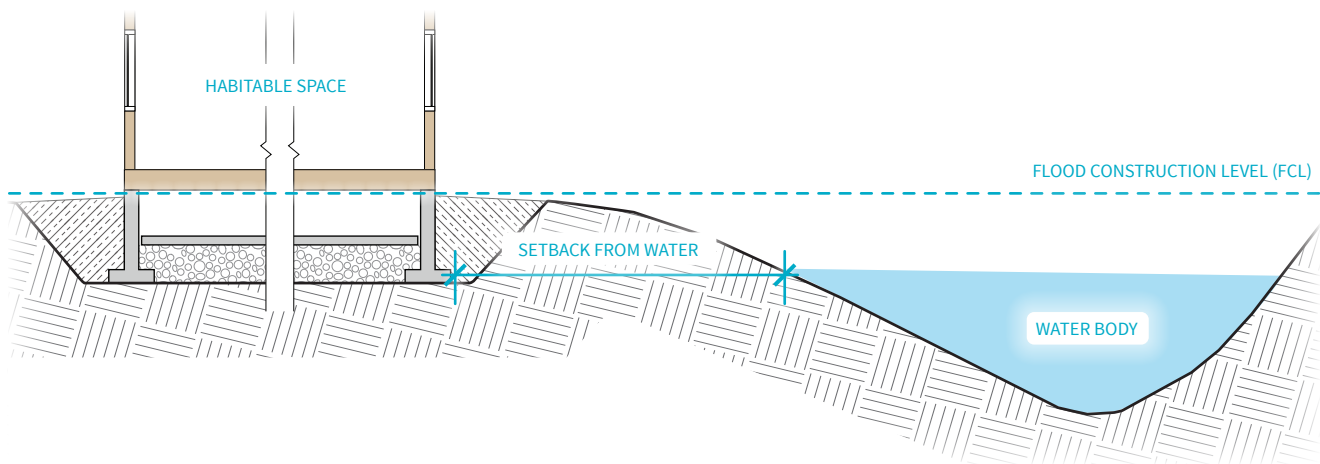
Schematic cross section of the Flood Construction Level (FCL).
